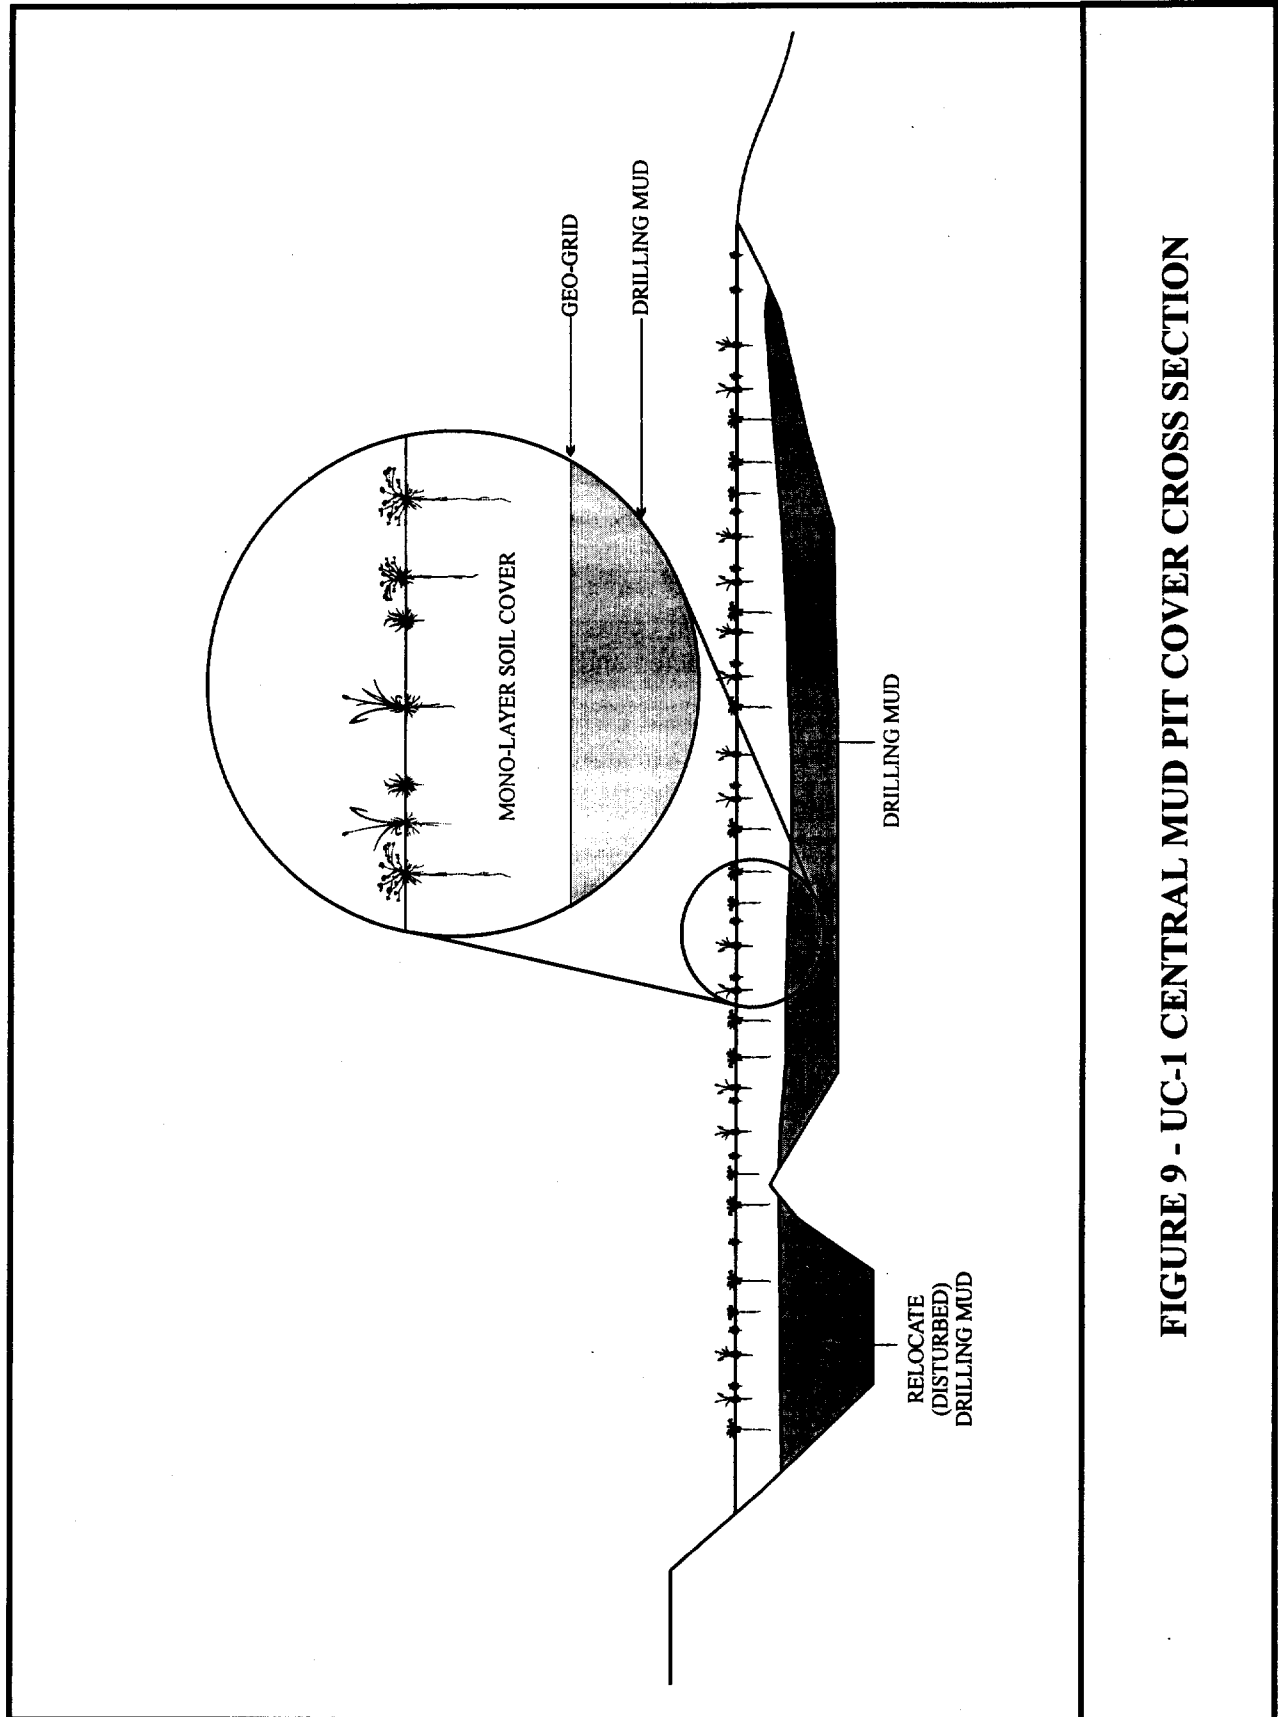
UC-1 CENTRAL MUD PIT COVER CROSS SECTION
